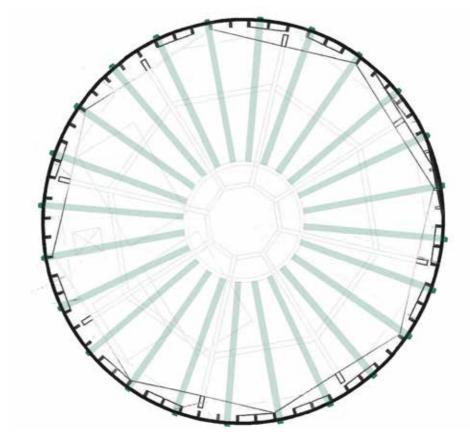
Timber roof rolls (L) at base level in plan view (2019) © H&R (SLHA edit)
